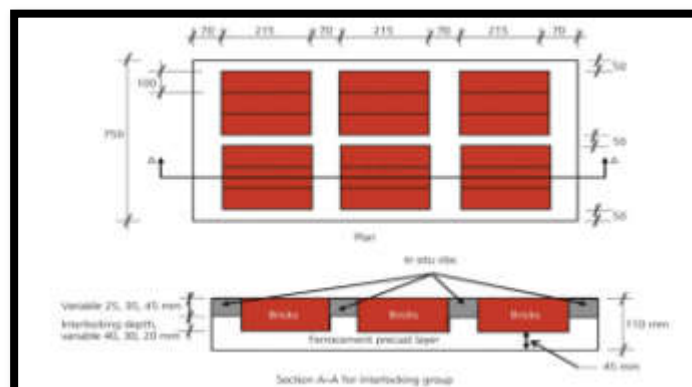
Plan and cross-section details for tested specimens [30].
